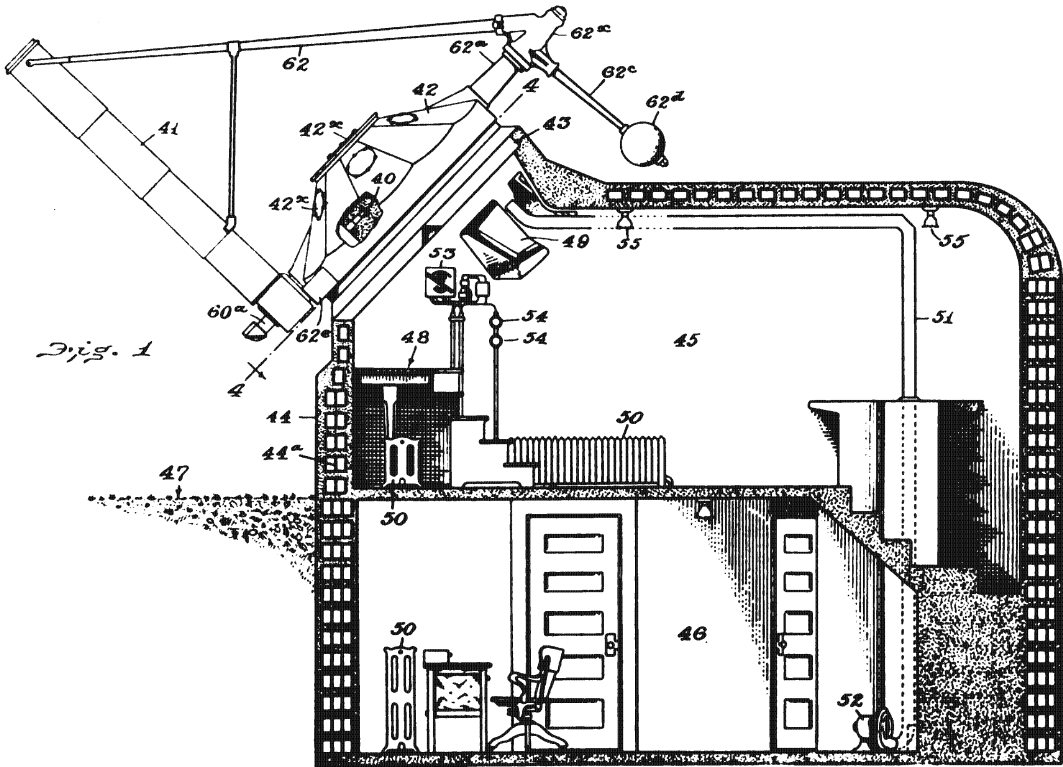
SIDE ELEVATION OF THE TELESCOPE AND DOME AND A LONGITUDINAL VERTICAL SECTION OF THE BUILDING WHICH FORMS THE HOUSE FOR THE OBSERVER
